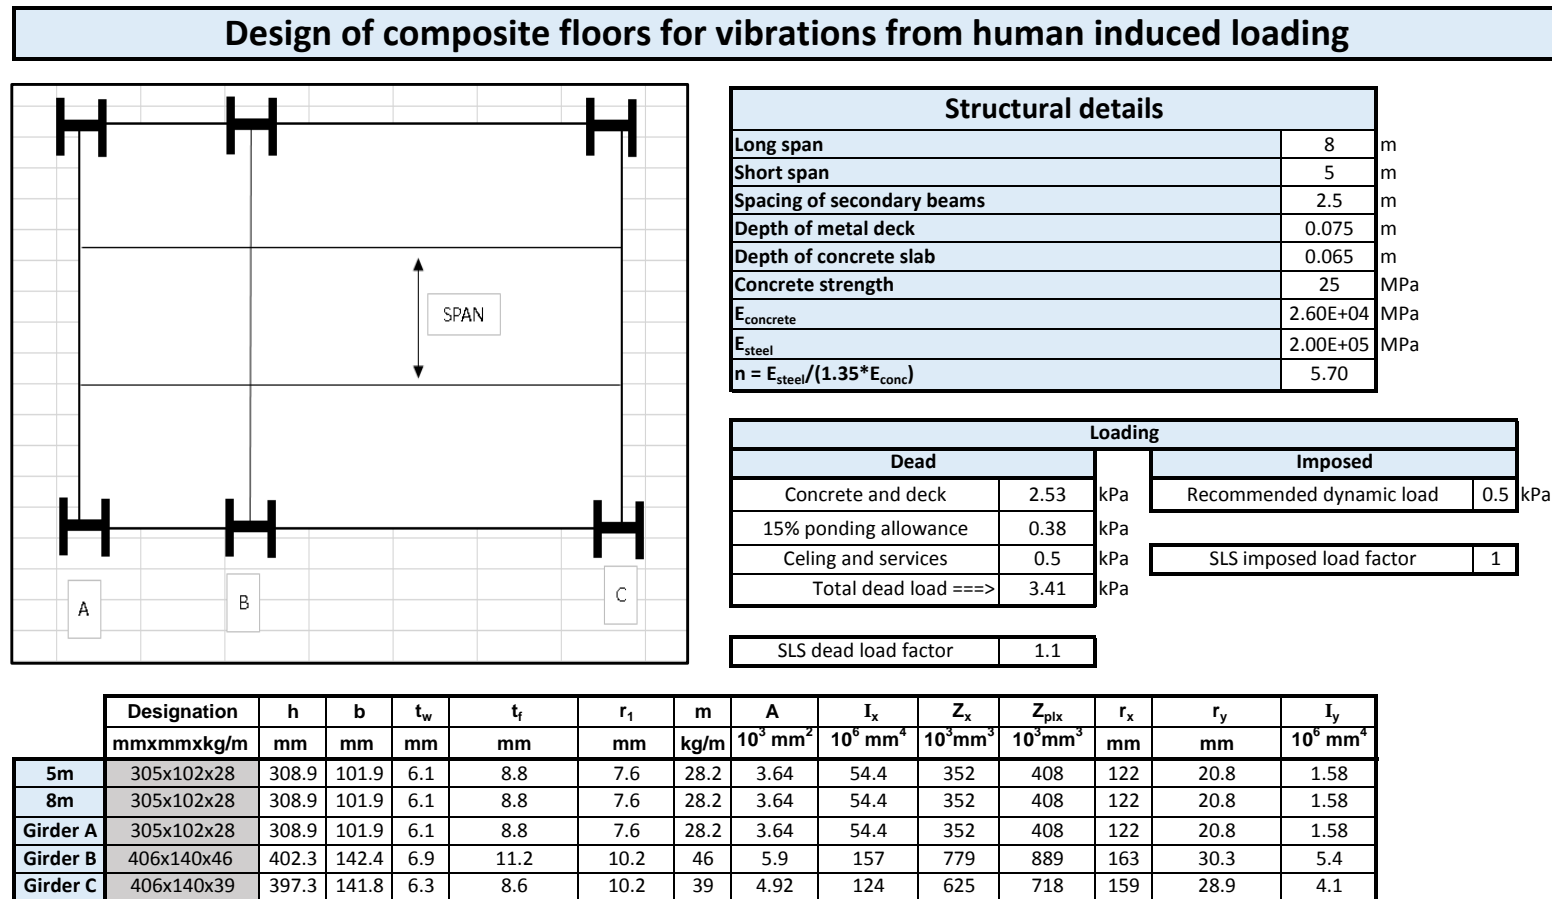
Floor vibration calculations for short span composite structure - Page 1
